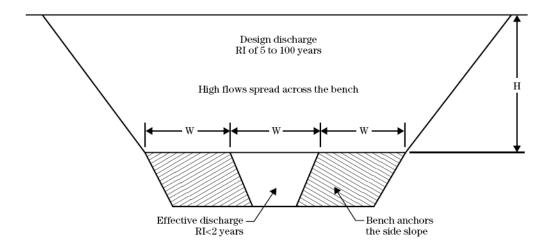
Two-stage ditch geometry illustrating benches not found in typical trapezoidal ditches (Source: USDA NRCS).
